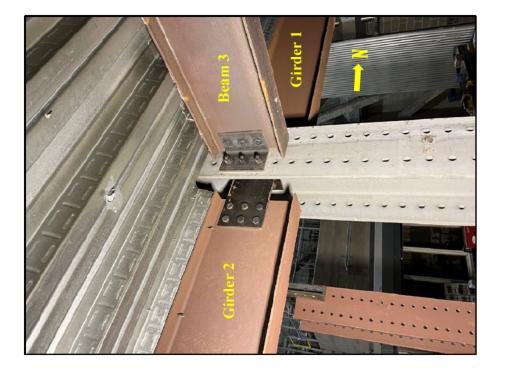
Image showing the shear tab connections between girder and beam and supporting column.
